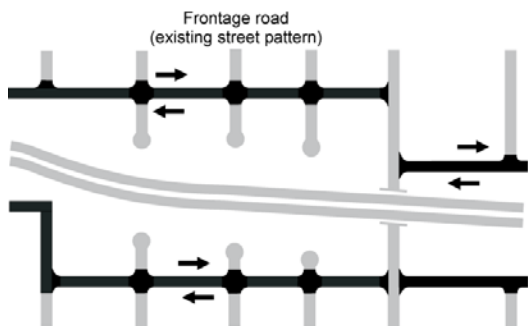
Frontage roads can collect and distribute crossing traffic
